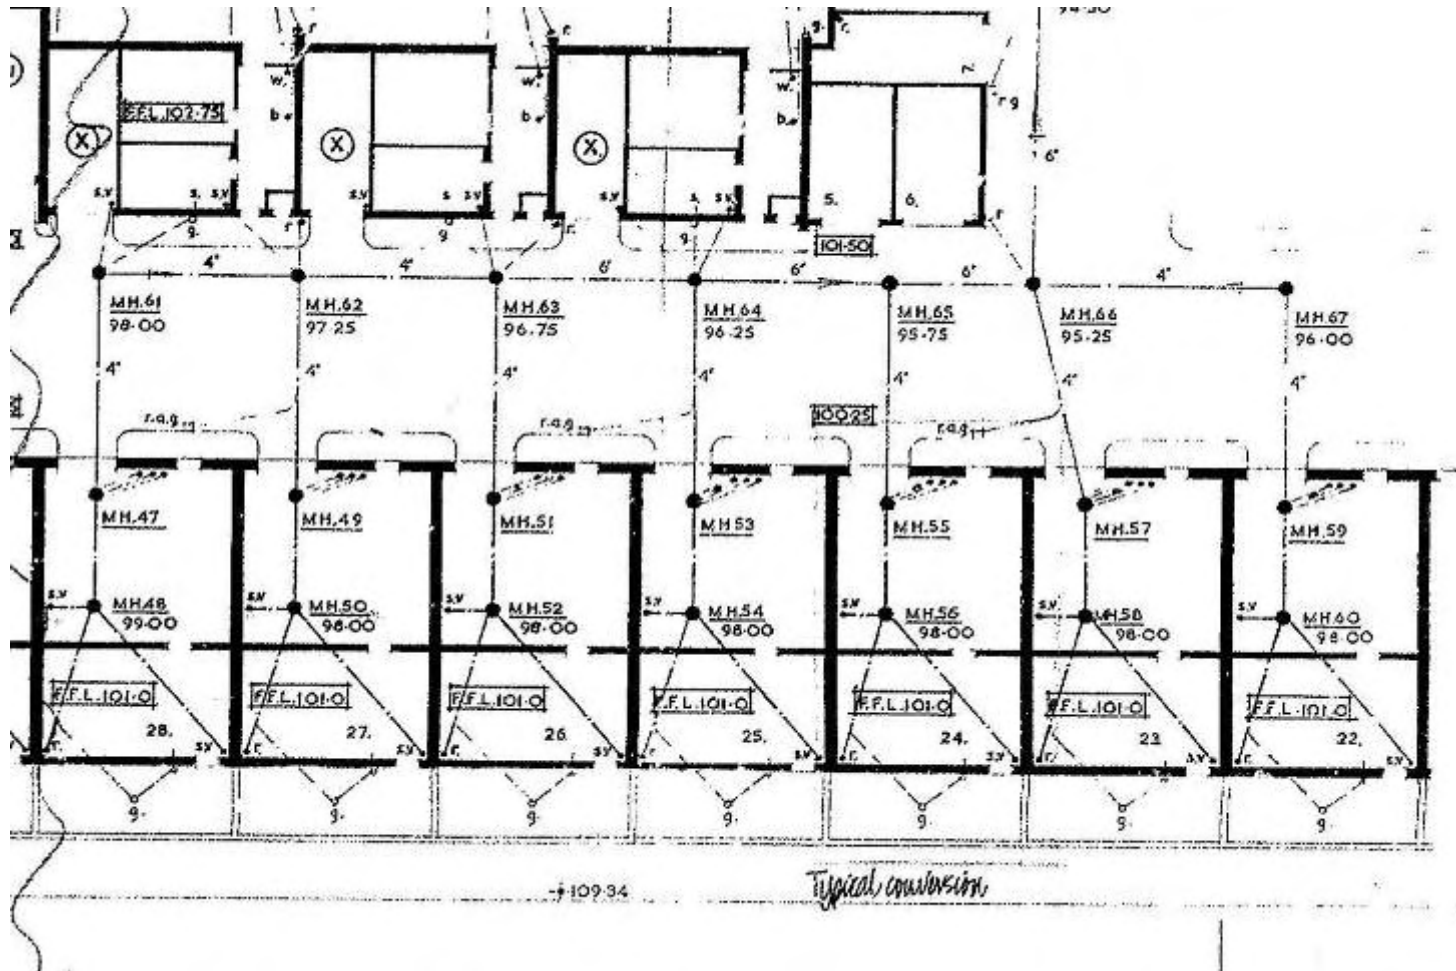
Extract from the 1963 Chester Terrace Development drainage plan by Louis de Saisons, Peacock, Hodges & Robertson. This plan shows the location of the new drainage of gulleys underground drainage connections, etc.
